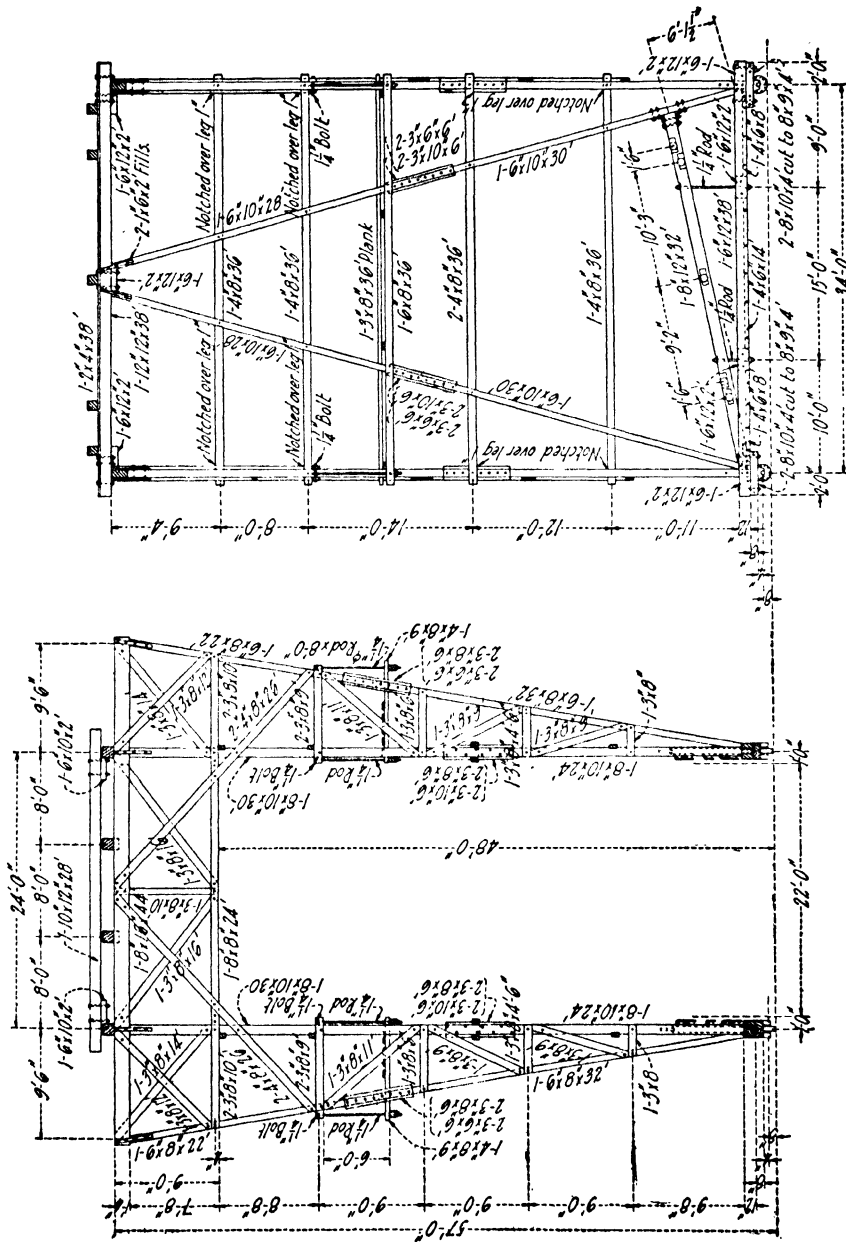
THROUGH BRIDGE TRAVELER. AMERICAN BRIDGE COMPANY.
